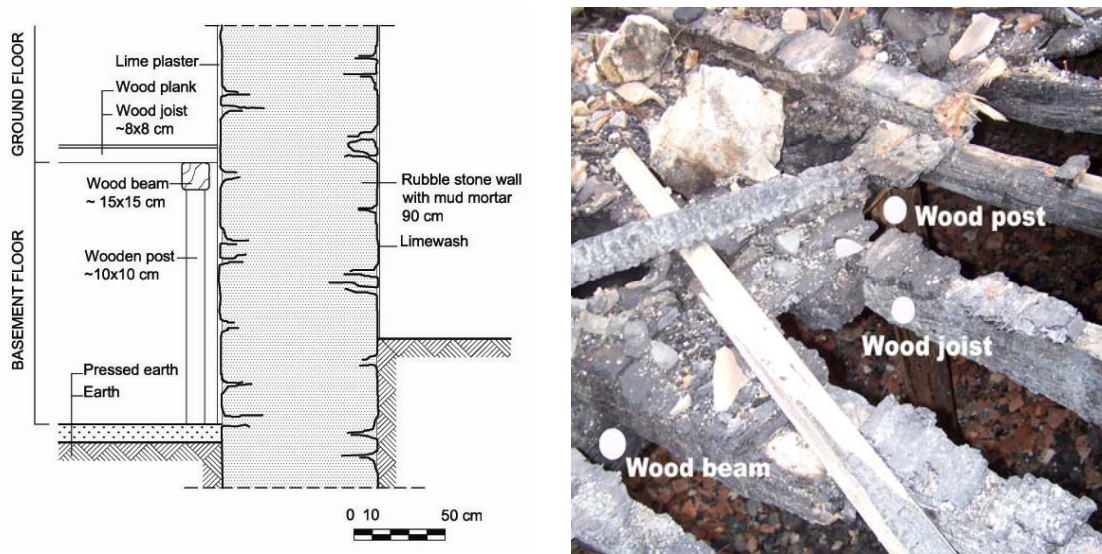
Wood beam supported by wood post in ground floor (Şeyh Cami St. No: 32)
